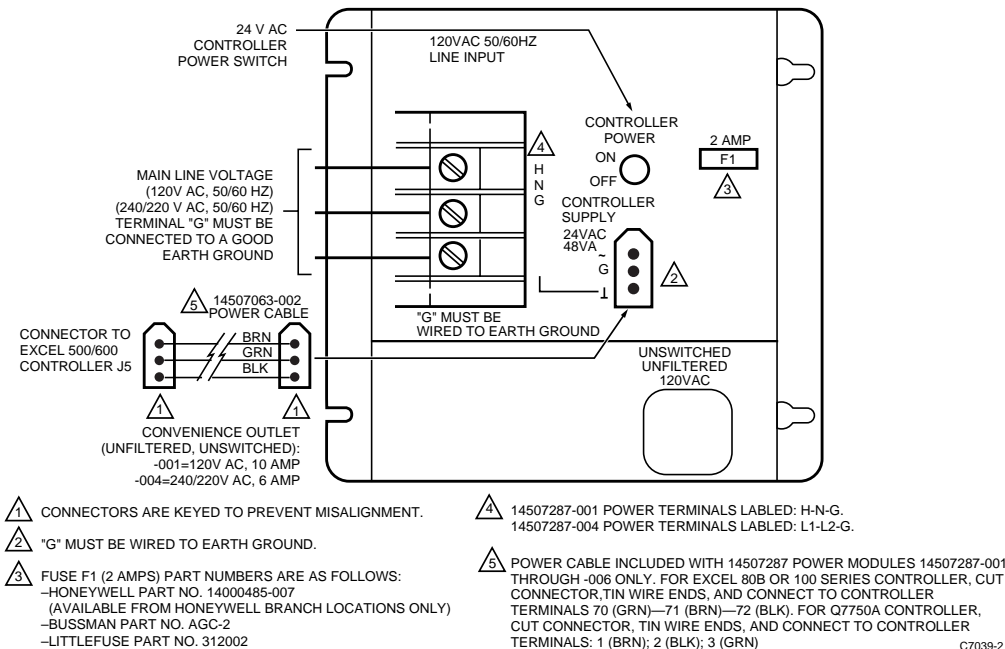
Typical 14507287-001, -004 Power Module wiring.
